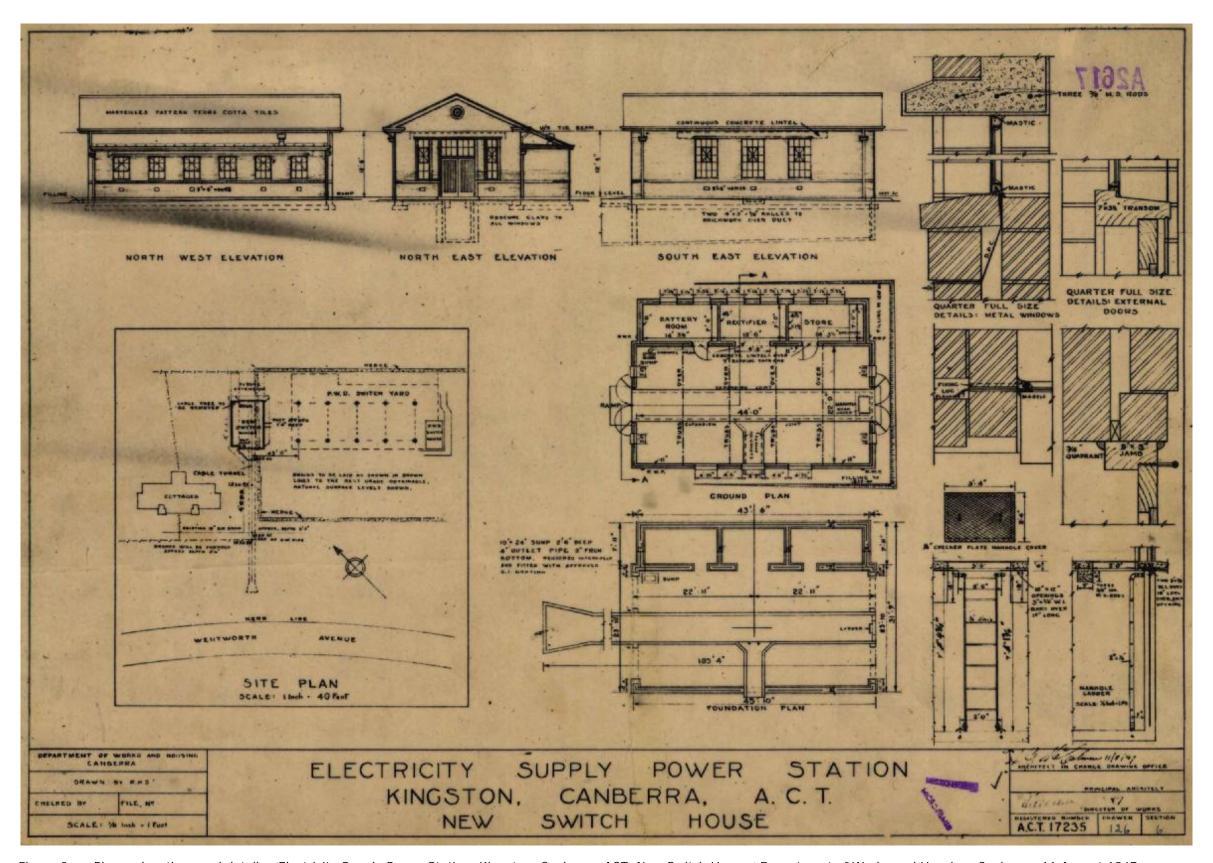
Plans, elevations and details: 'Electricity Supply Power Station, Kingston, Canberra, ACT, New Switch House,' Department of Works and Housing, Canberra, 11 August 1947. Source: National Archives of Australia.
